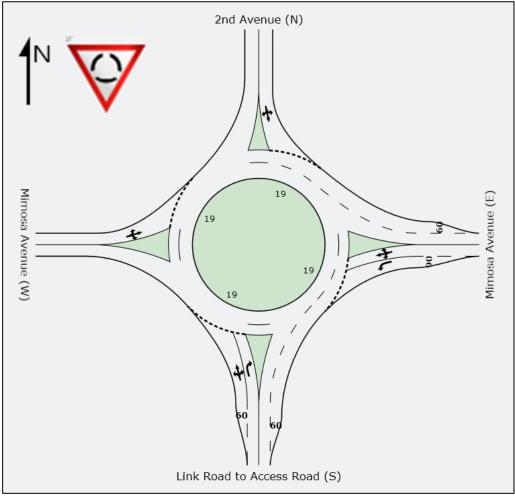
PROPOSED LINK ROAD TO ACCESS ROAD CONFIGURATION
